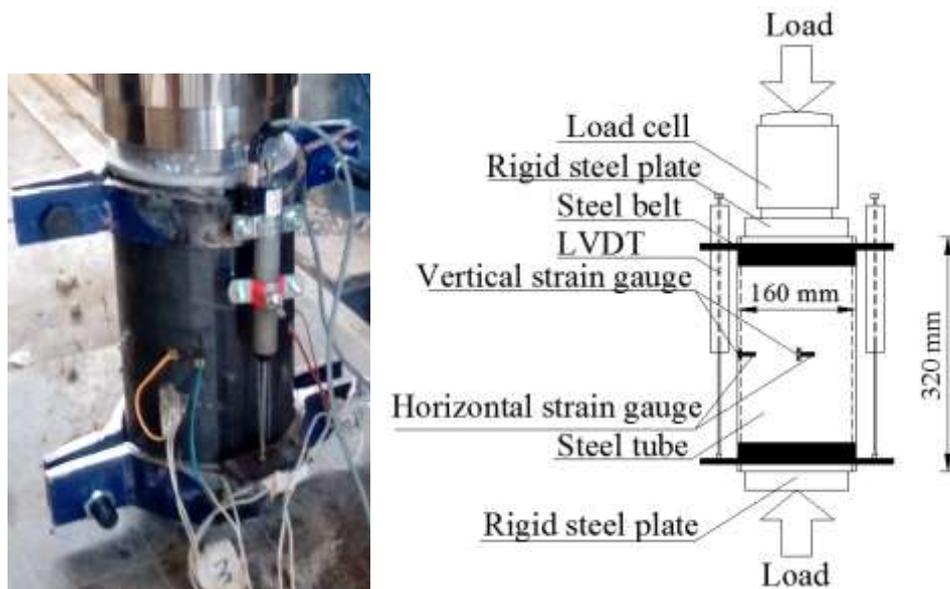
Test setup and arrangement of strain gauge and LVDTs for sets (2, 3) specimens'.
